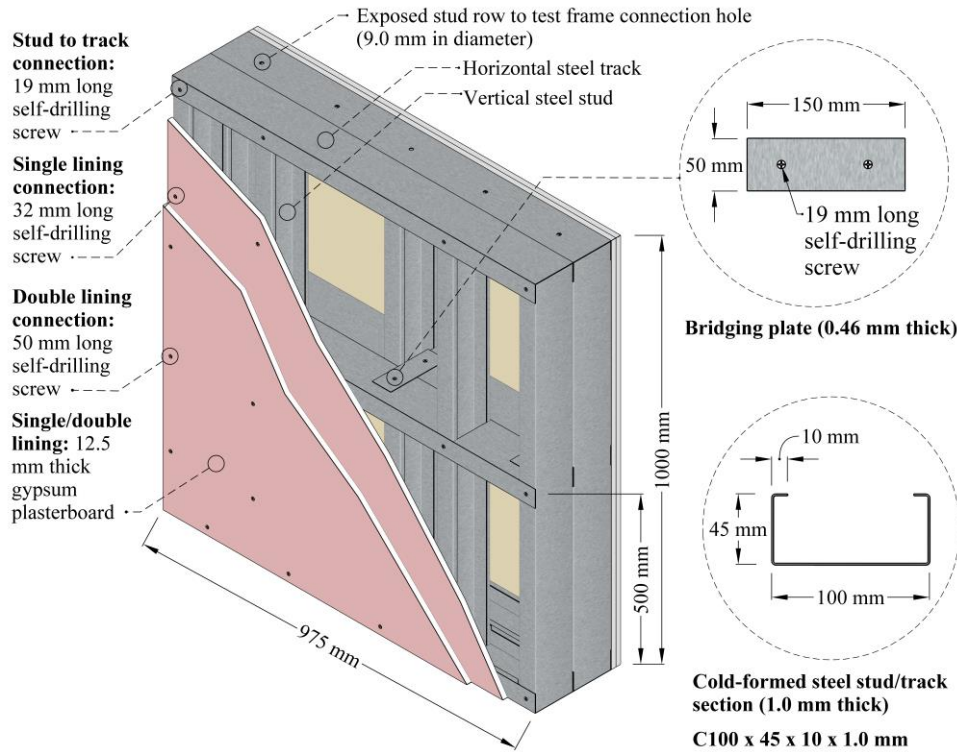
Schematic steel frame and lining details (specimen 2).
